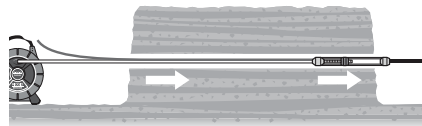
CROSSCHEK Inspection System Pulled Through With Air Hose
